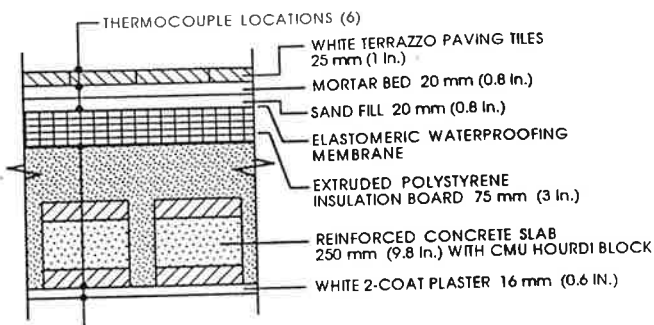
Roof 7: externally insulated (extruded polystyrene) hourdi slab.
